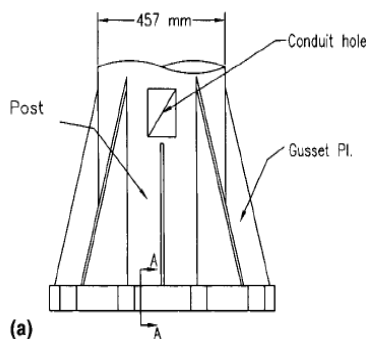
Profile of gusset stiffened socket connection (Gilani and Whittaker, 2000a)
